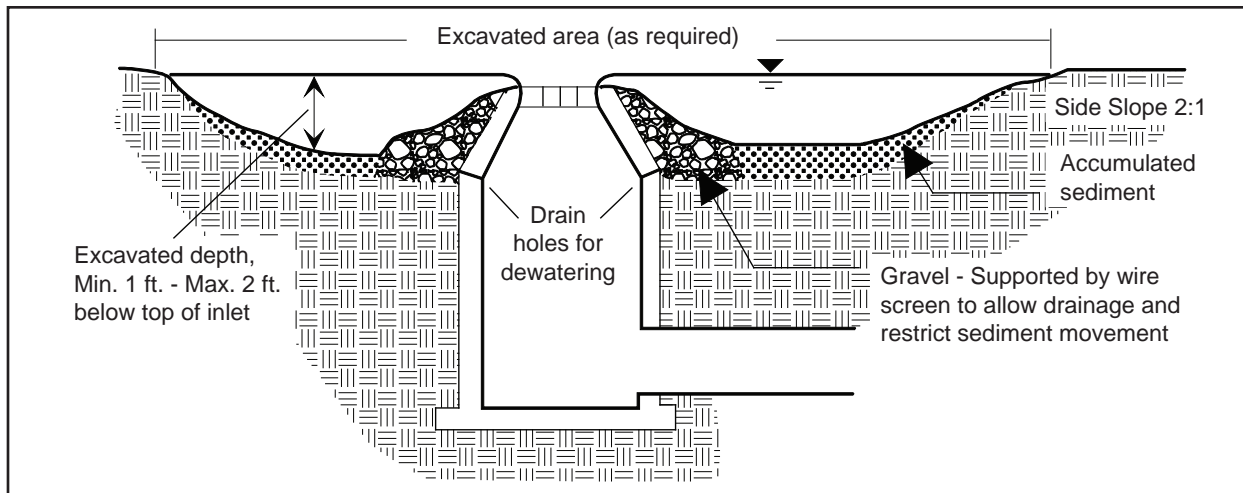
Cross section of Excavated Drop Inlet Protection
